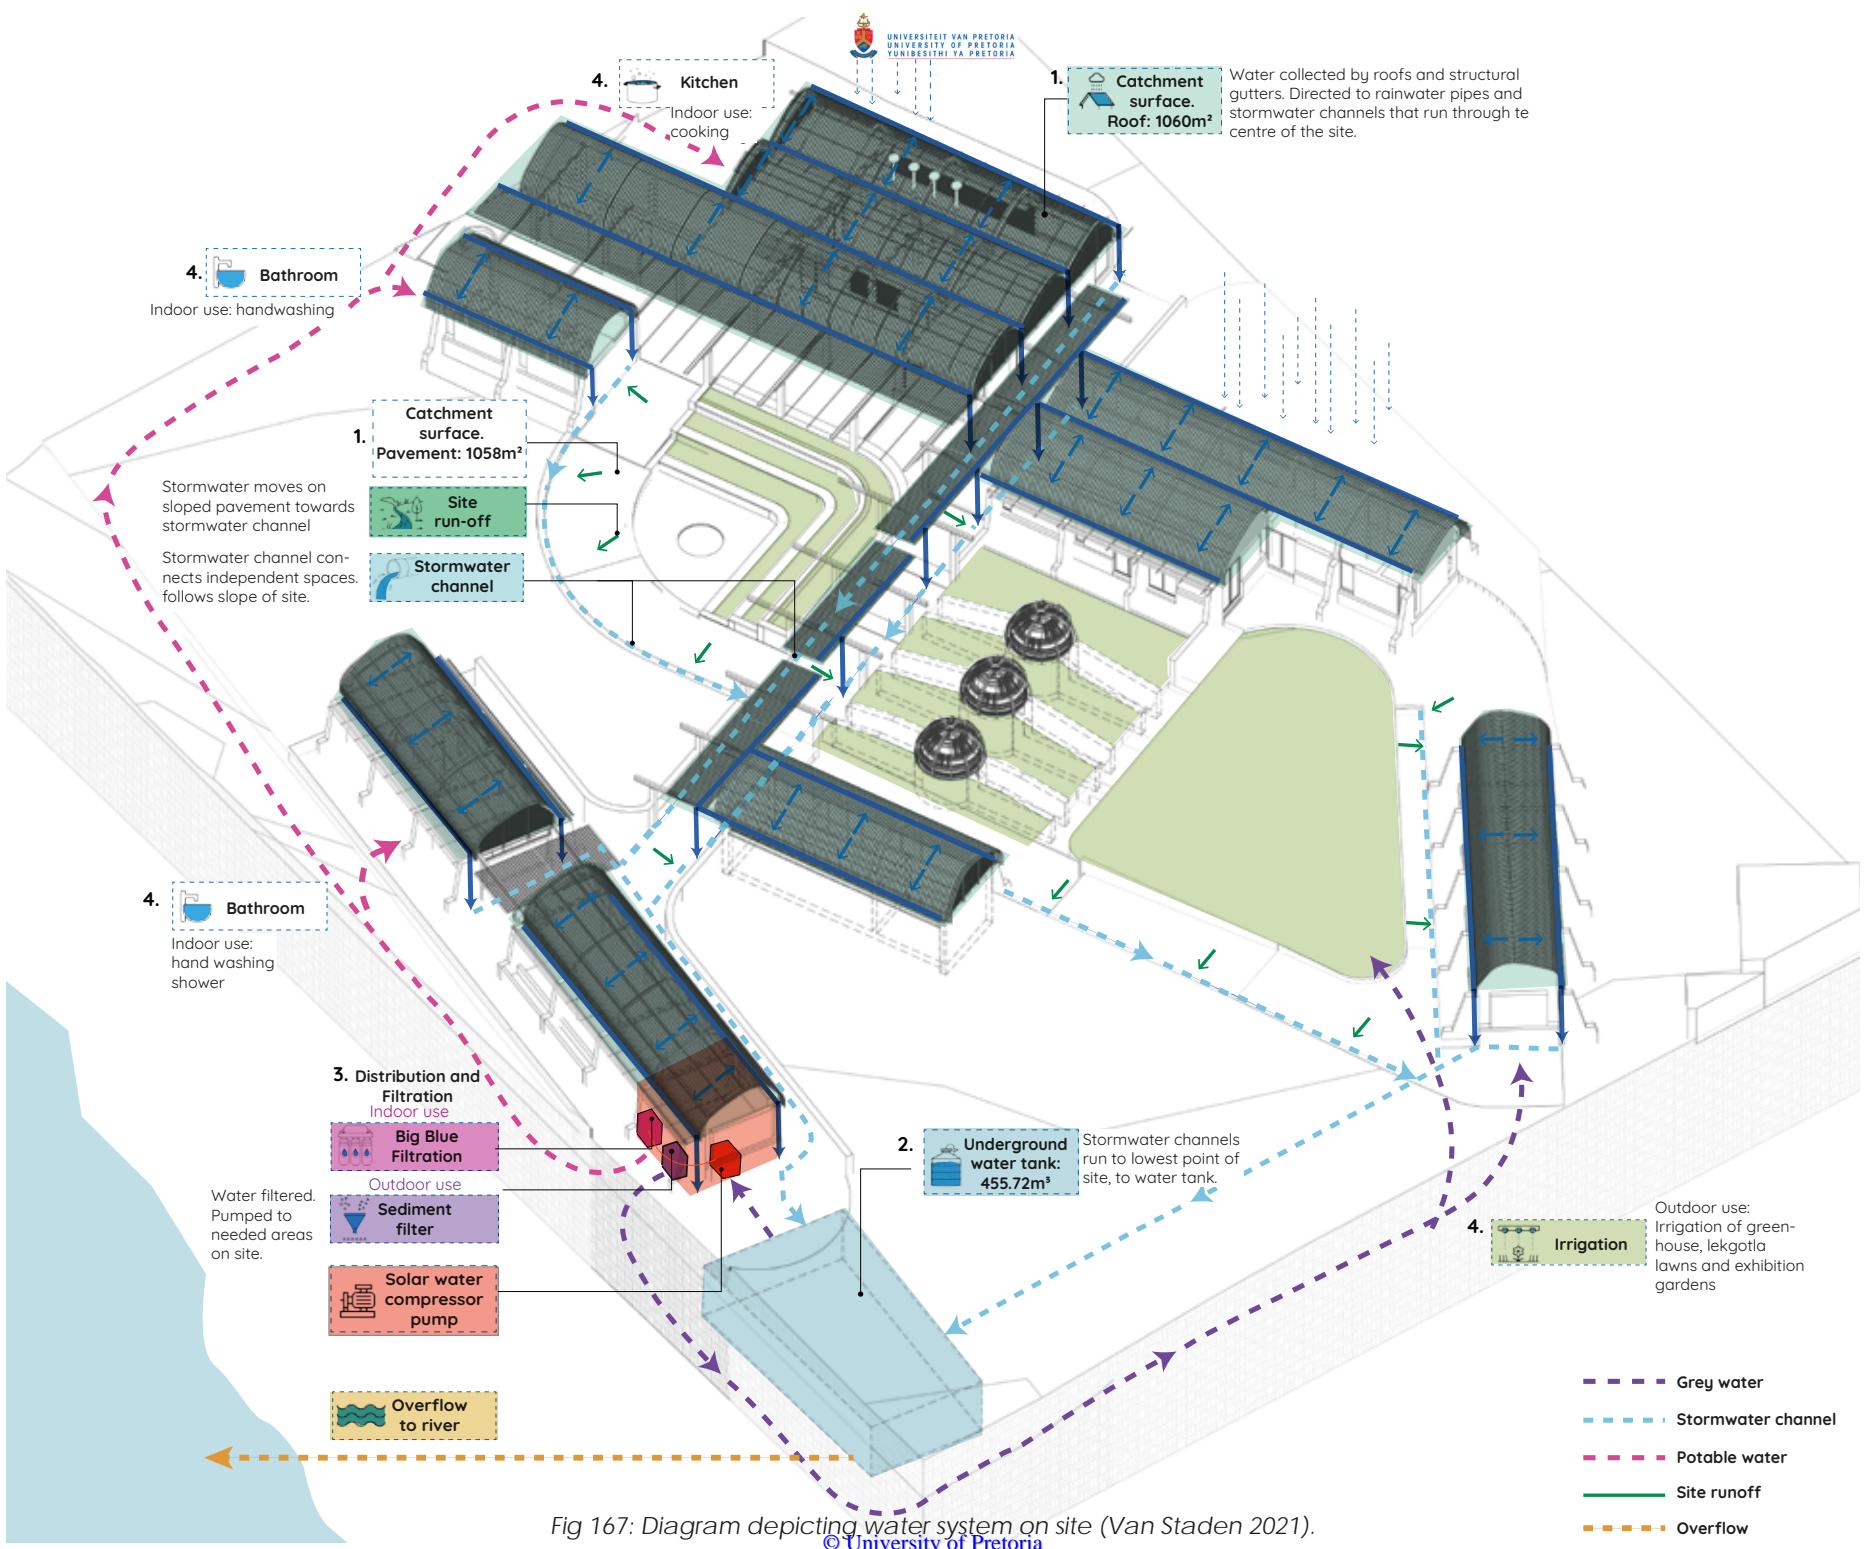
Diagram depicting water system on site (Van Staden 2021).
